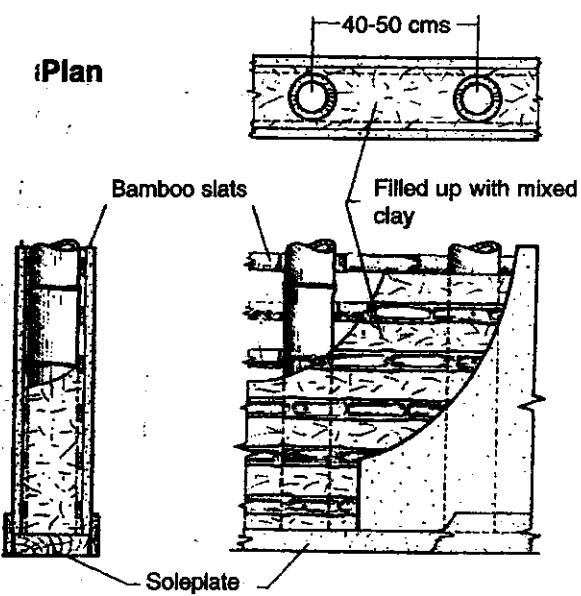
Fig. B The "cage" (*jaula*) is built with studs and bamboo slats (3-4 cm wide) which are fixed with nails to the studs with a separation of 7-8 cm. The cage is filled with clay mixed with straw. Once dry (after one month), the wall is plastered with two coats of fine clay,sand and cement. (Photo: Dicken Castro).
